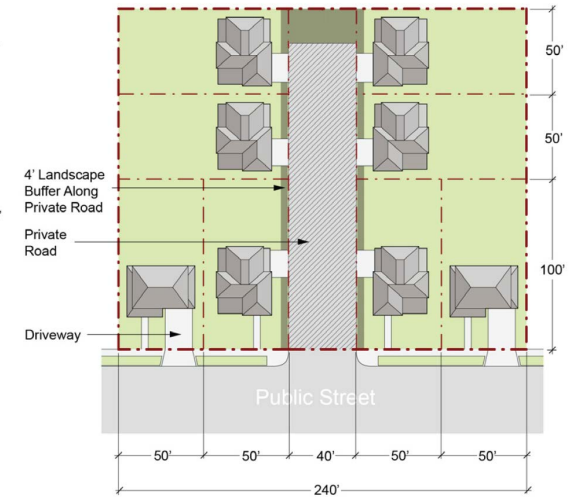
Subdivided parcels oriented towards the public right-of-way, and parcels located on both sides of the private road.
